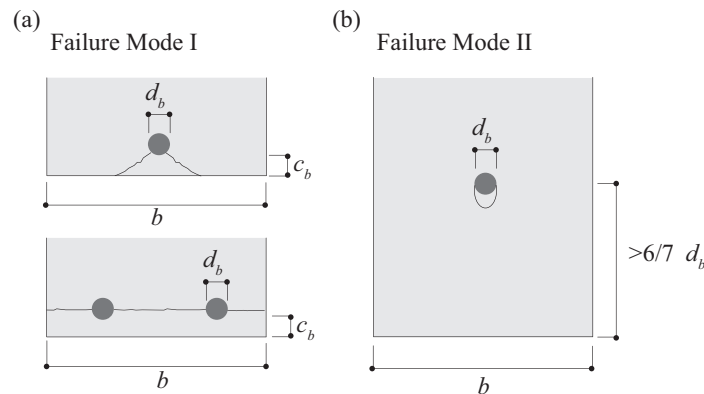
Failure mechanisms: (a) splitting cracks at the bottom or at the side; (b) crushing of concrete or yielding of the longitudinal bar
